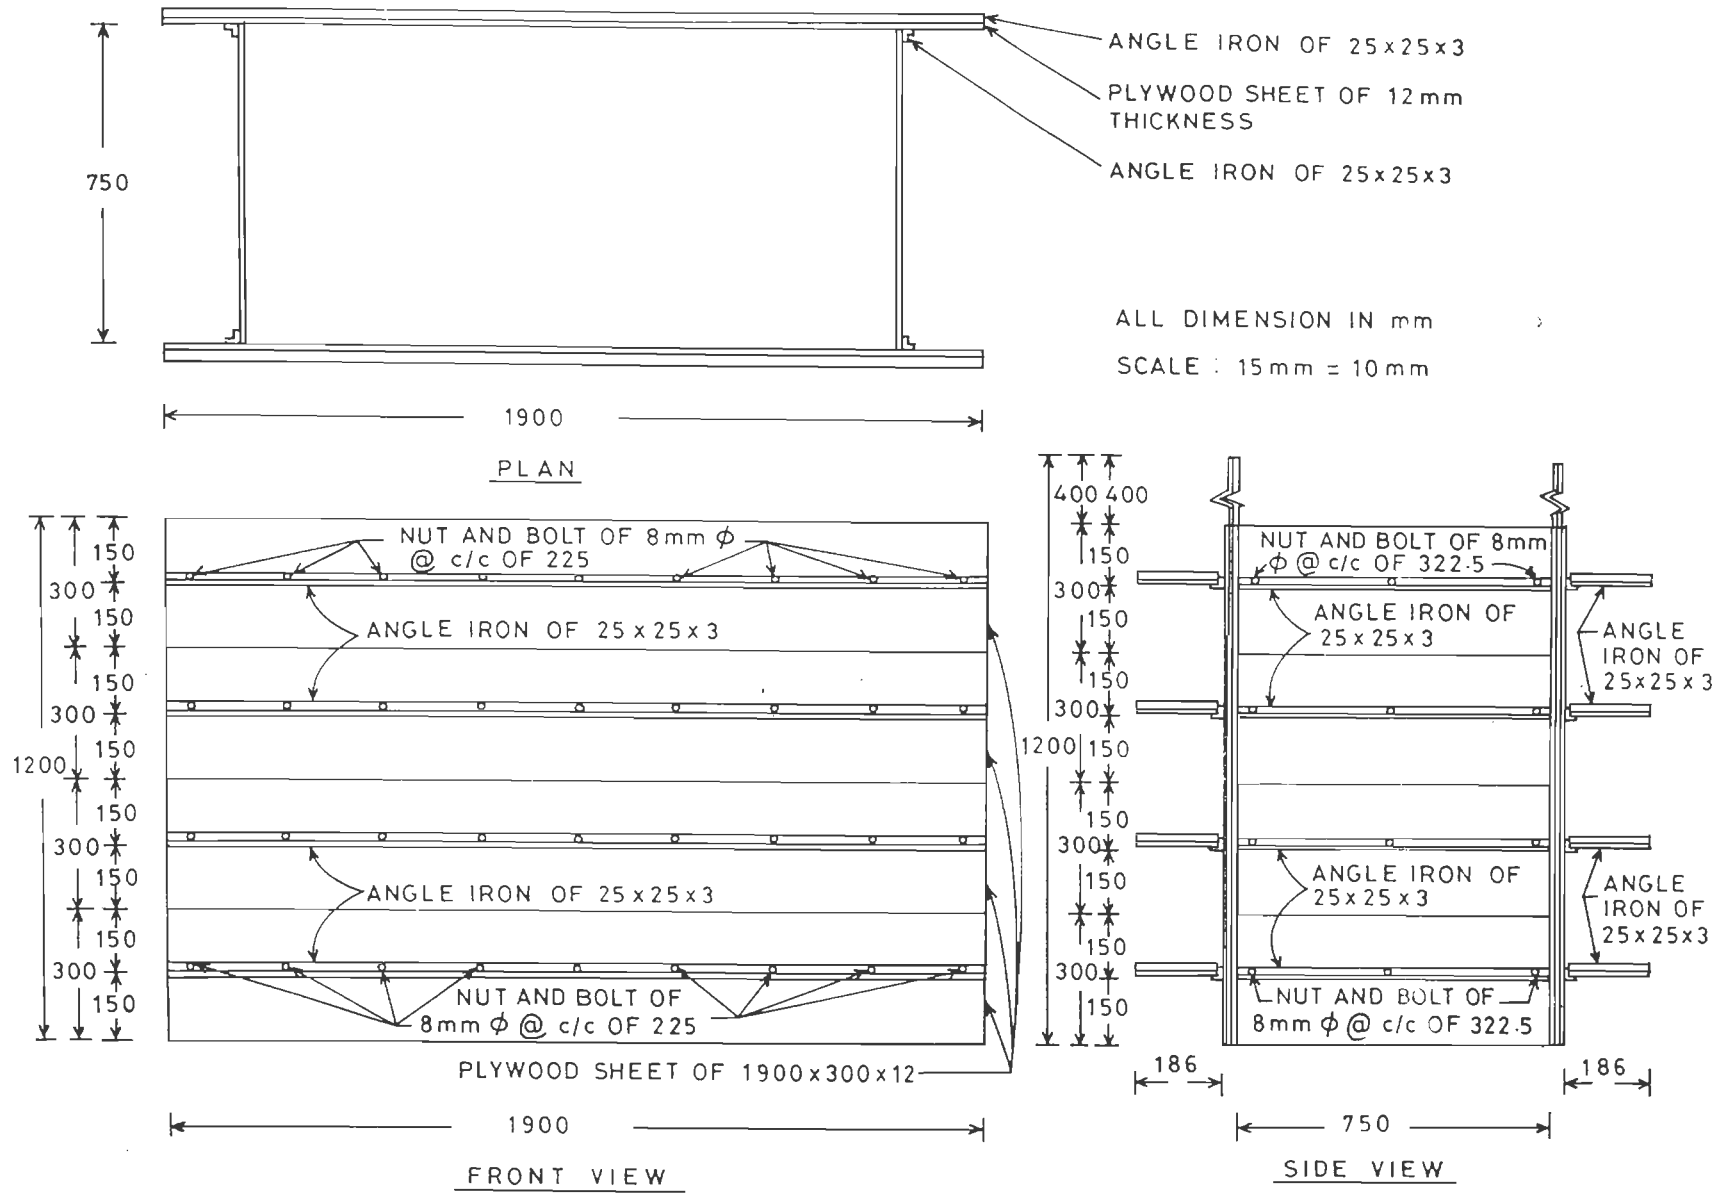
DETAILS OF FORM WORK FOR PREPARATION OF TEST EMBANKMENT.
